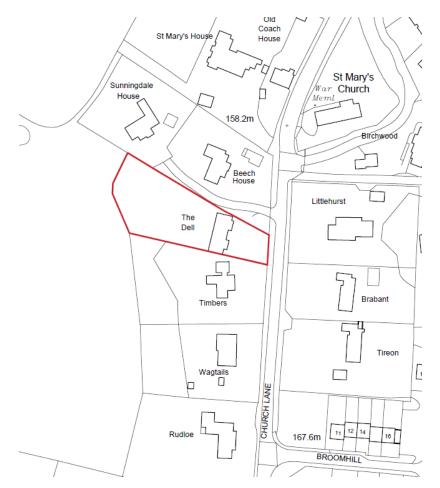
Site location plan with the application site outlined in red. Extract from drawing no. 1622/S-01
